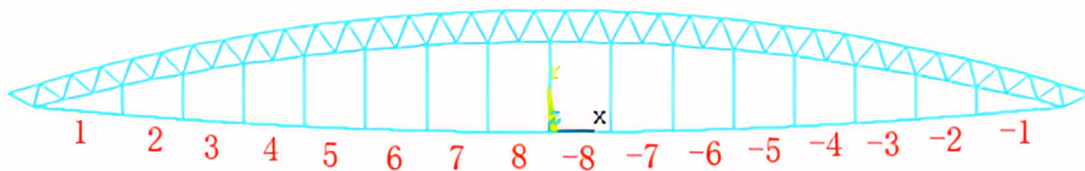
Finite Element Model and Cable Numbering of the One-Way Beam String Truss
